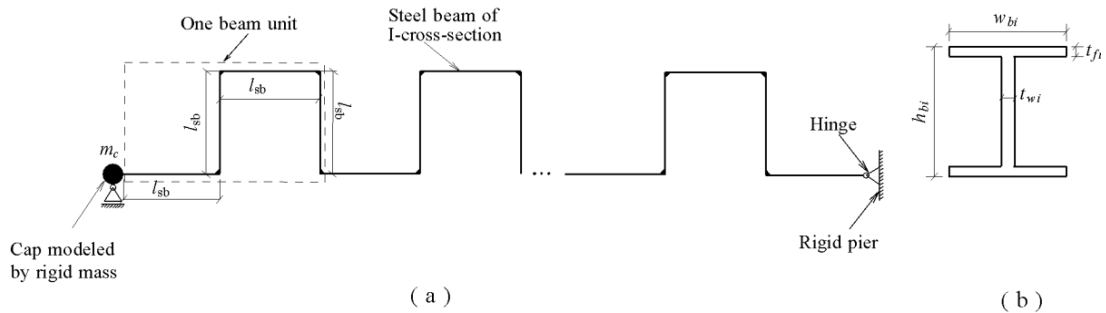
Configuration of (a) the cap-steel-beam structure and (b) I-cross-section of steel beams. N_{bu} : number of beam units in one plane; l_{sb} : length of each single steel beam; m_c : cap mass [7].
